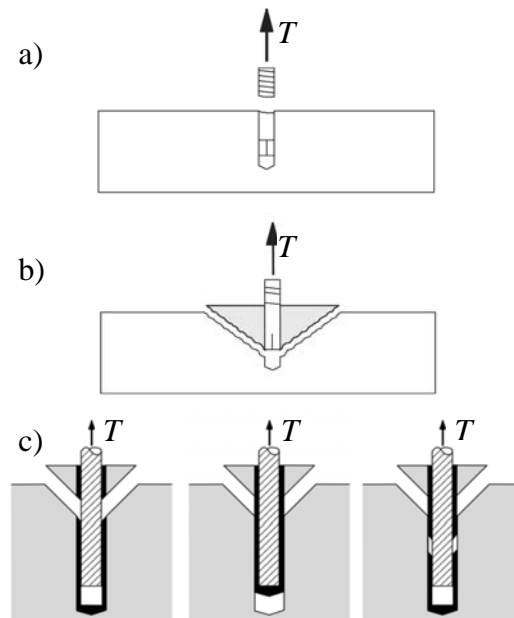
Failure modes of bonded anchors under tension load T : a) steel failure; b) concrete cone failure, c) bond failure; (Hoehler, 2006)
